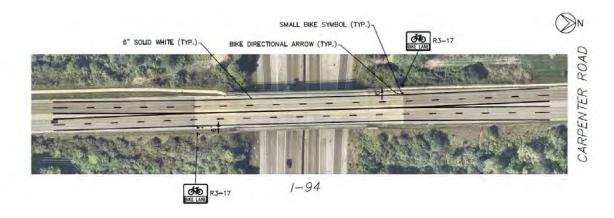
Proposed Bike Lanes and New Lane Geometry at Carpenter Road Crossing I-94
